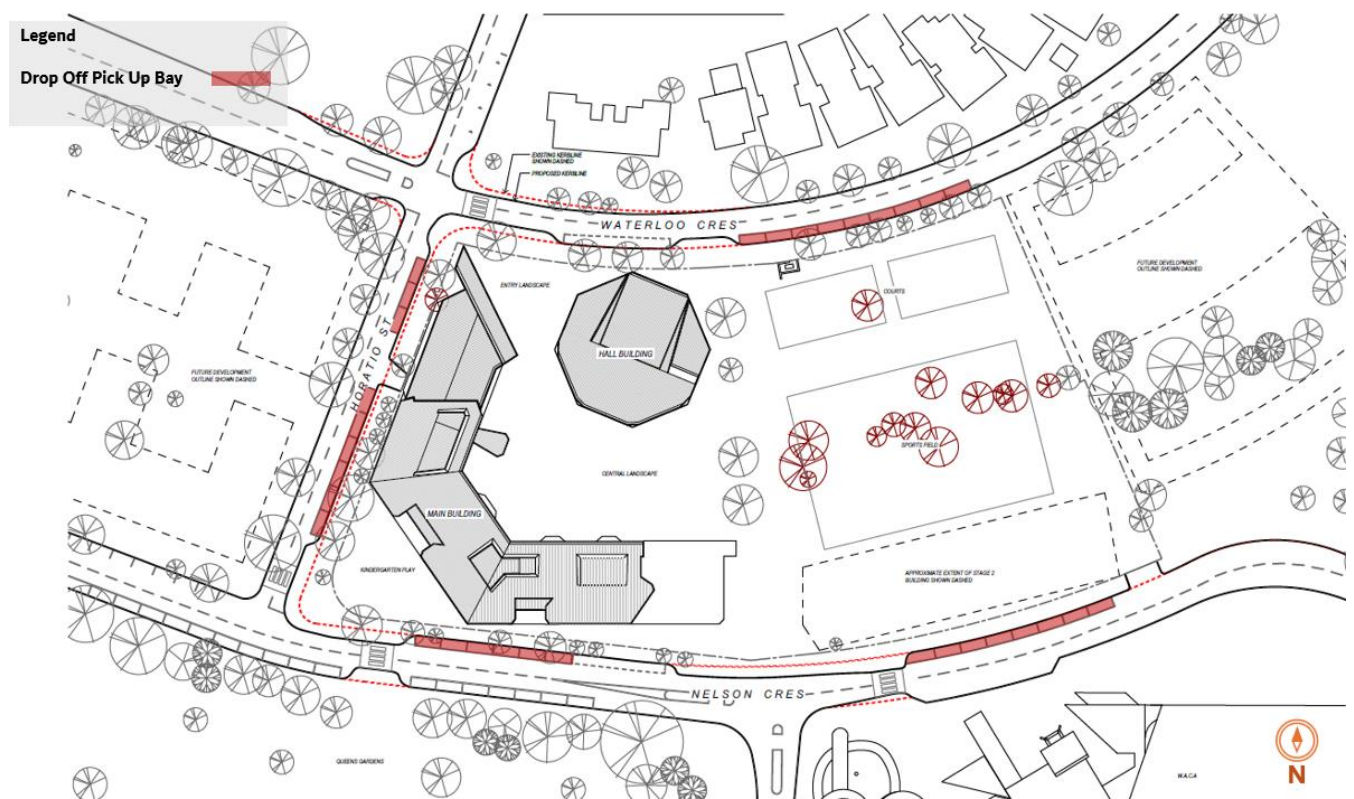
Location of proposed drop off and pick up facilities at EPPS (source: EIW/ARM)
